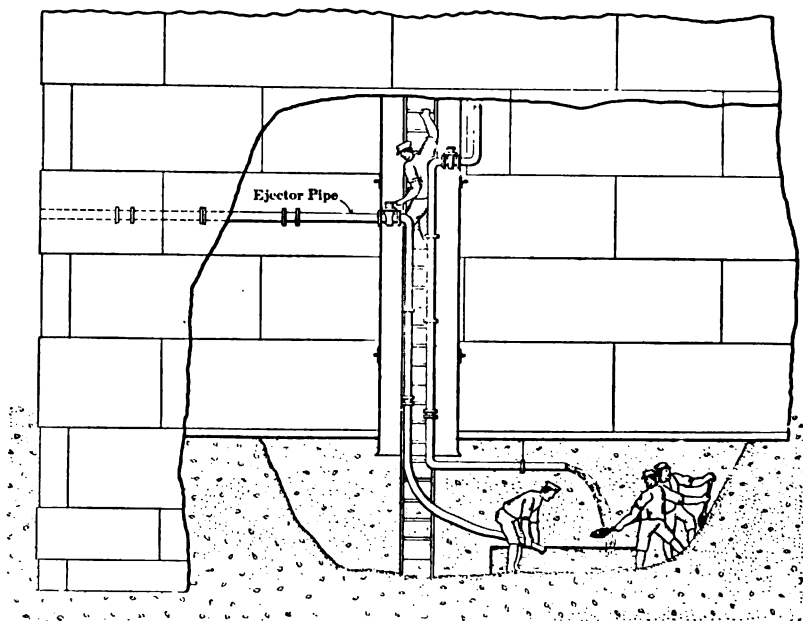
EXCAVATING AND DISCHARGING MATERIAL FROM CAISSON.
